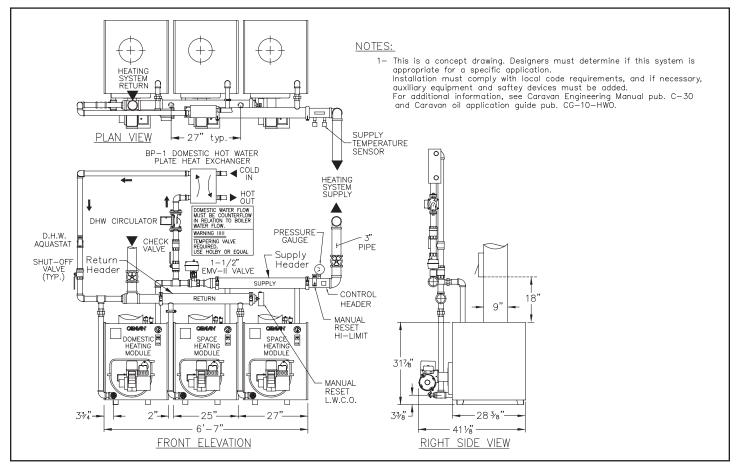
Typical space heat and domestic piping – For primary circulation only.
